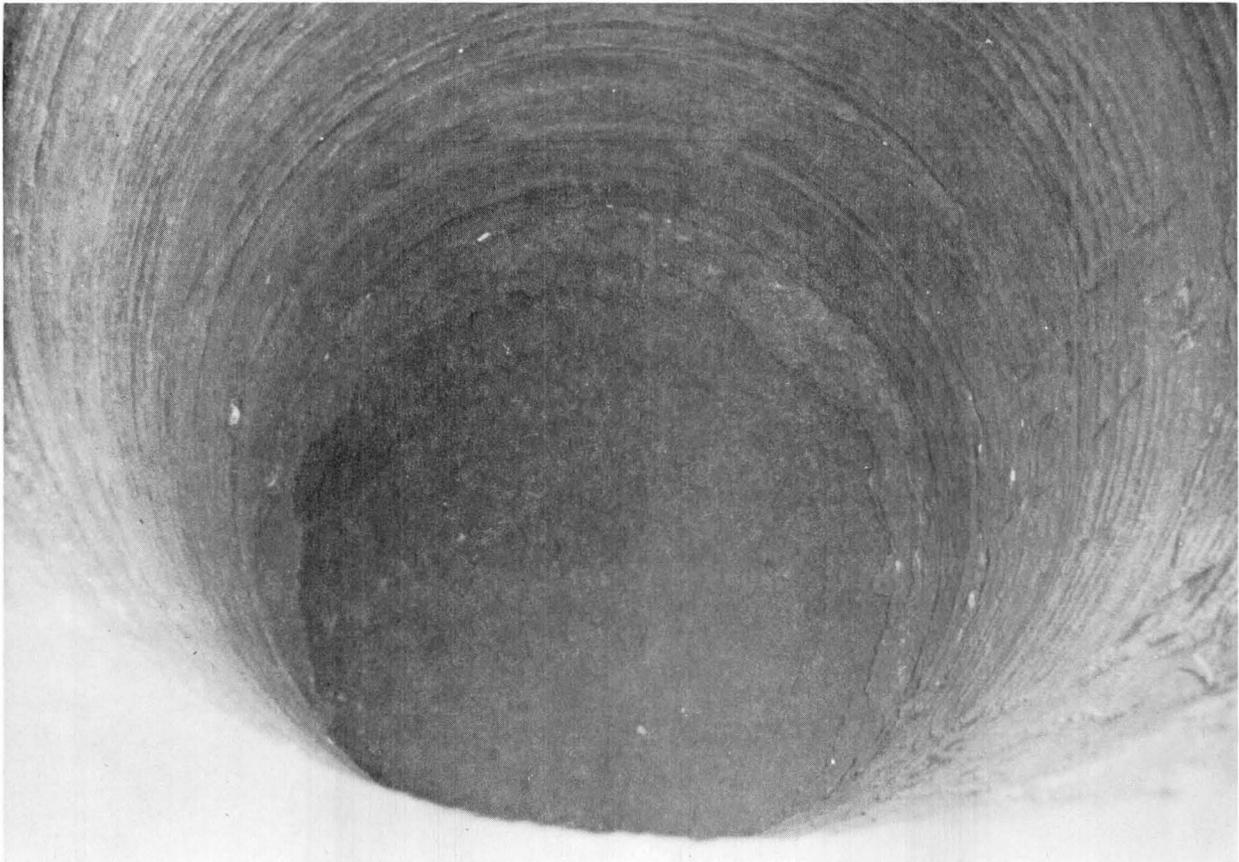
DOWNHOLE VIEW OF CAVITY USED FOR DRY WELL
